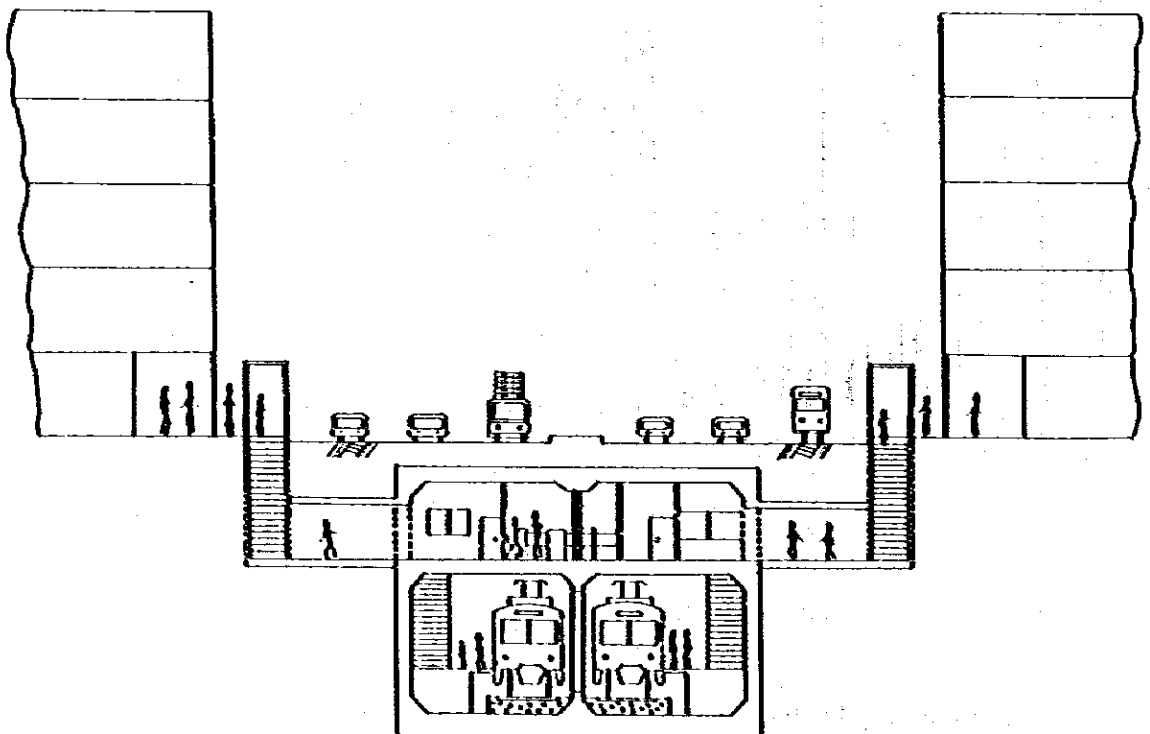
TYPICAL CROSS SECTION (Subway)
